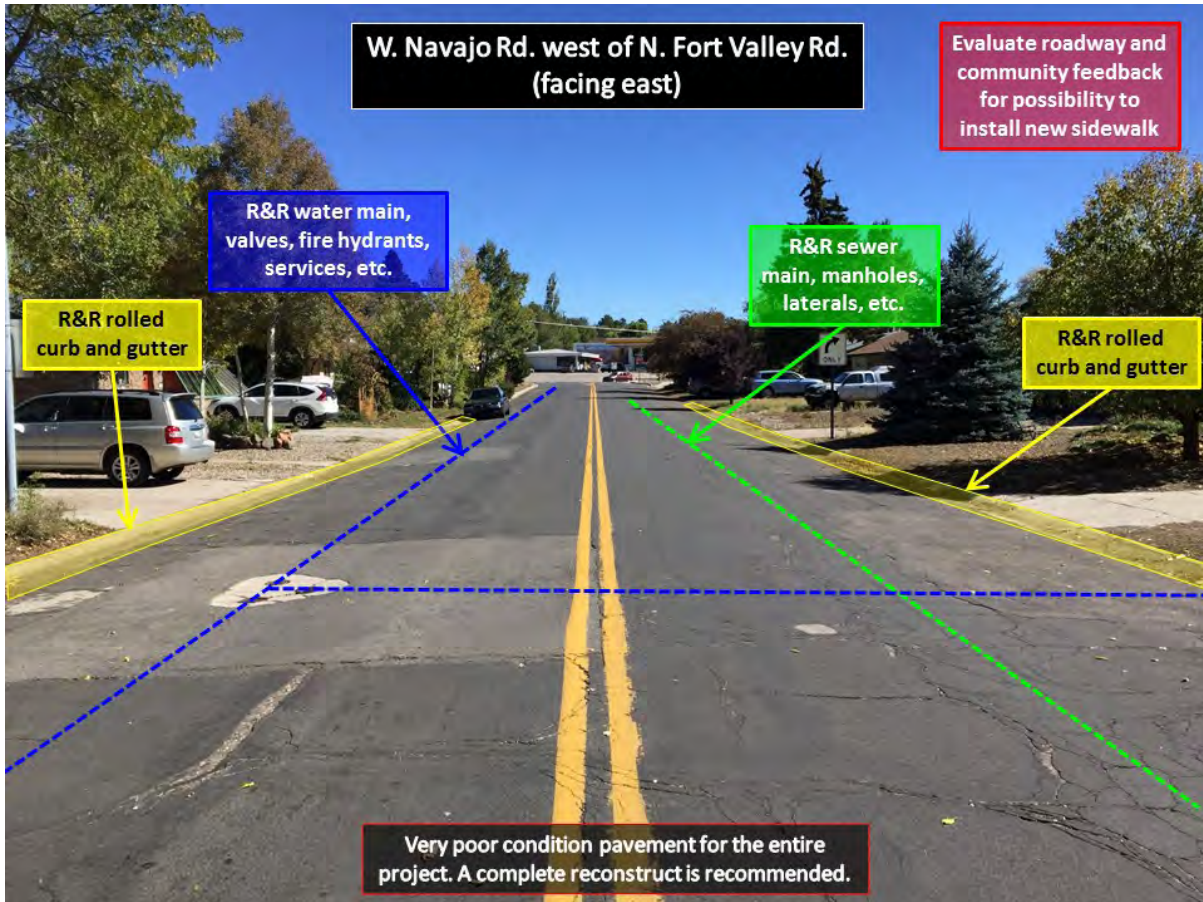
R&R water/sewer mains & appurtenances, pavement section, and rolled curb and gutter.
